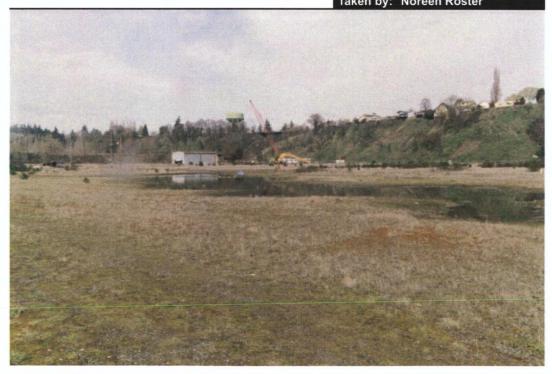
Upland vegetation of central portion of site. *Direction: Northeast
